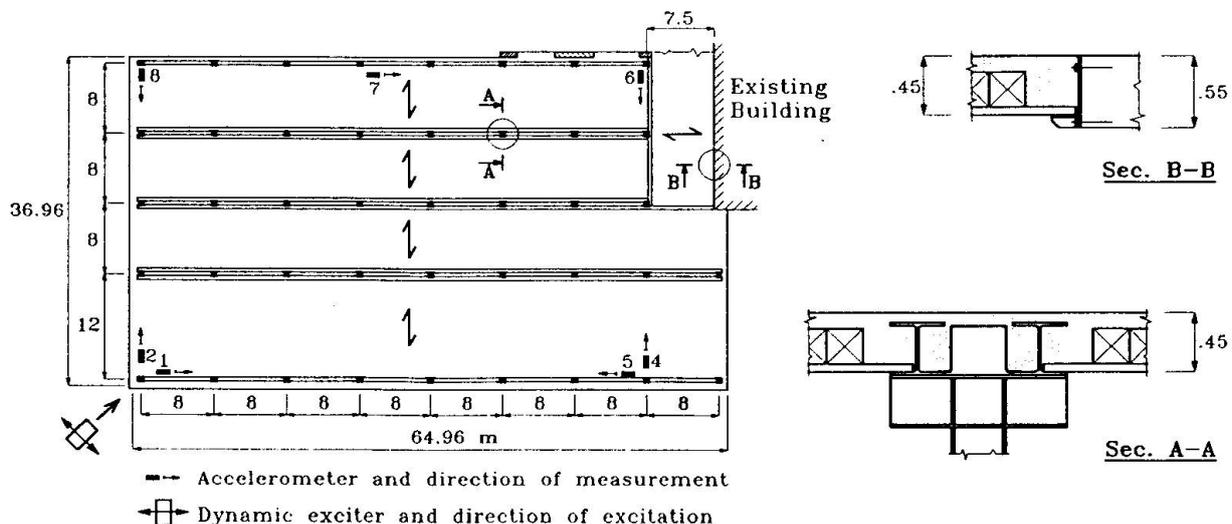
Mixed RC-steel structure: roof floor plan and location of instruments
